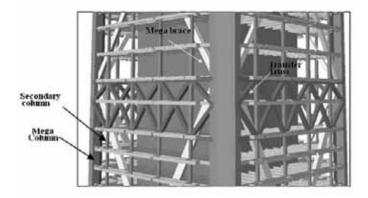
Illustration of Mega Frame and Mega Brace connection – double-story truss
